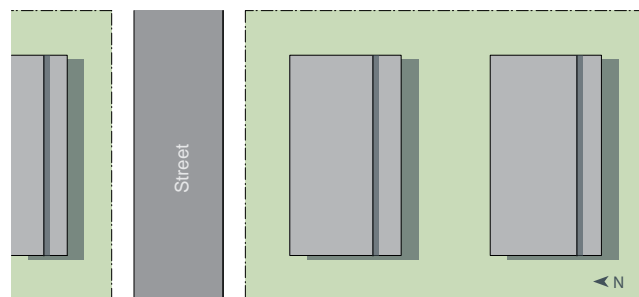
B.2 Building orientation and height influences solar access to apartments and common open spaces. On south facing slopes, orient the rear wing of the building(s) east to west to maximise solar access, on north facing slopes, step building(s) with the slope
